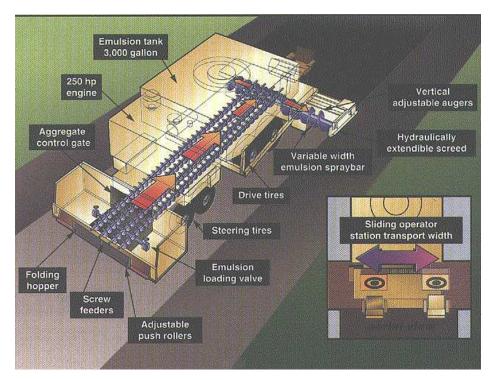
Elements of a Novachip Paving Machine (Russell et al. 2008)
